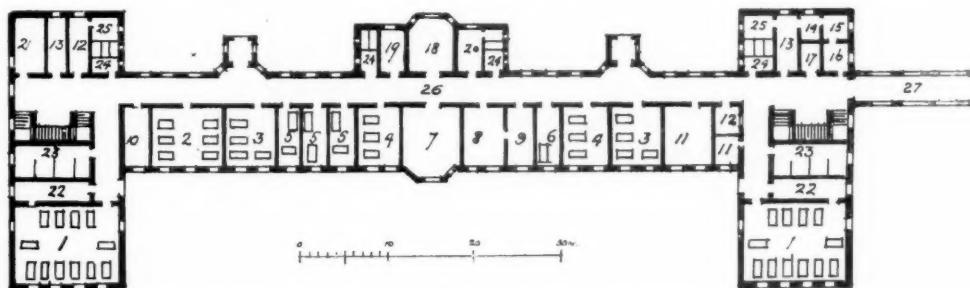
GROUND FLOOR PLAN OF SURGICAL PAVILION, THE THIRD HOSPITAL, MUNICH.
